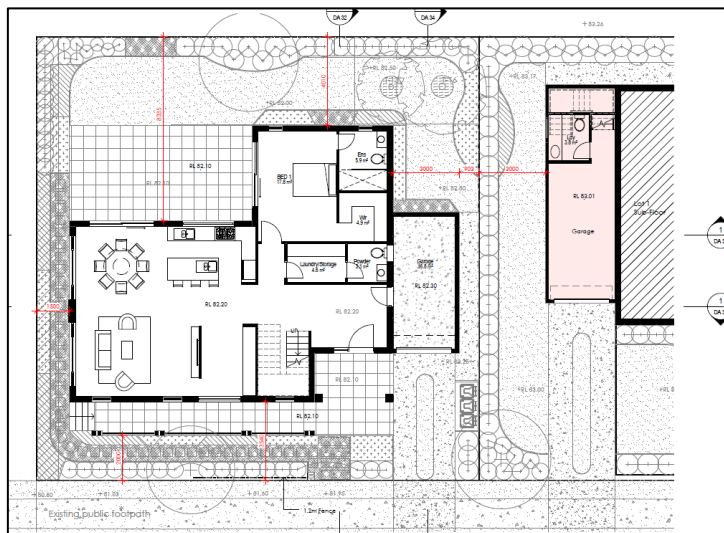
Proposed ground floor plan of new dwelling & lower ground floor plan of existing (heritage) dwelling
